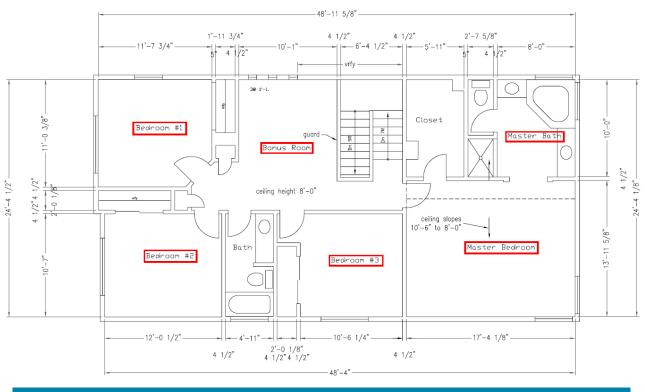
CALEB FLOOR PLAN – LOWER FLOOR
